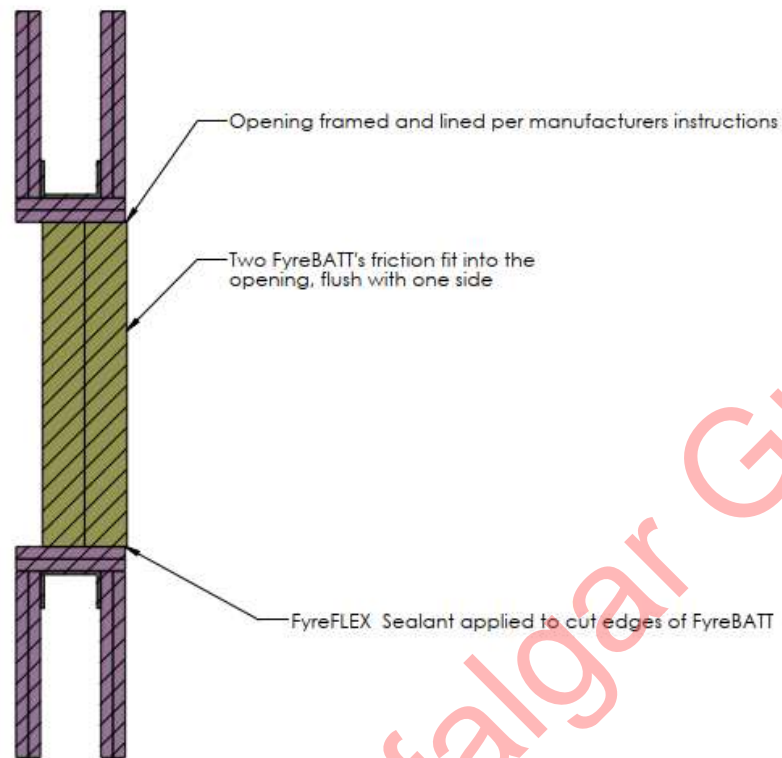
Blank seal protected with two layers of FyreBATT in plasterboard wall system
